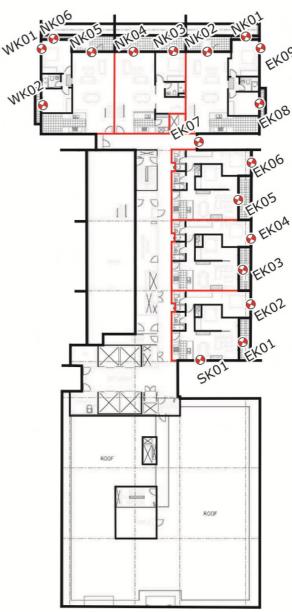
Opening Locations and Internal Apartment Layout - Level 28
